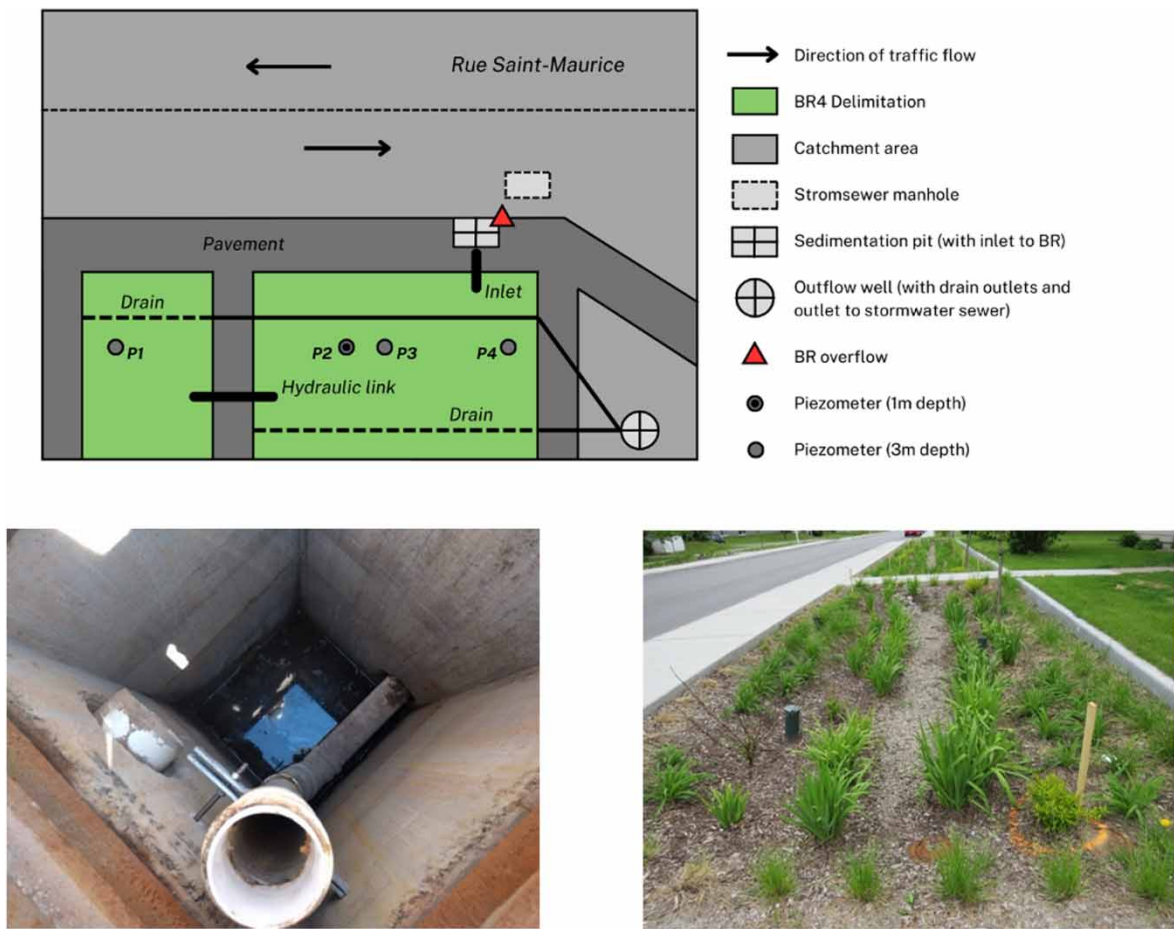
| Plan view representation of BR4, photo of inlet sump and bioretention (April 2019).
